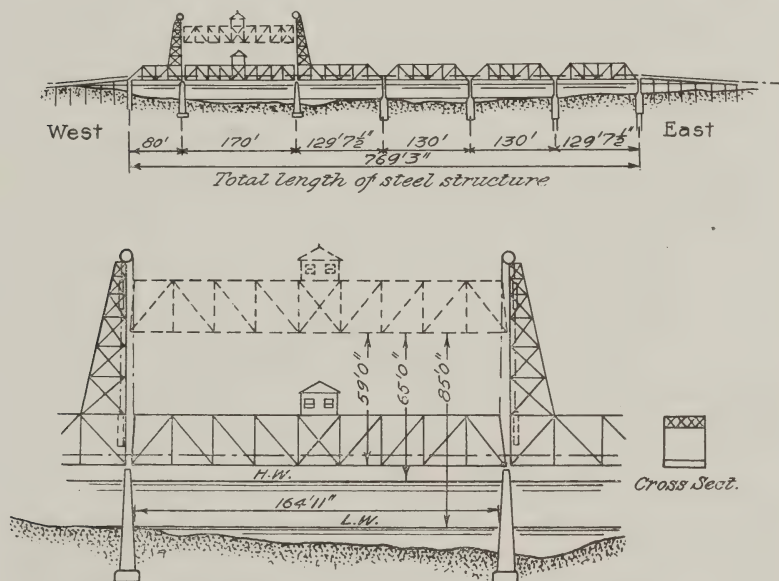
Vertical Lift Bridge over the Sacramento River at Tehama, Cal. Ordinary highway traffic is on a paved roadway 20 feet in the clear. The channel span is raised to accommodate river traffic and is fully balanced by concrete counterweights. It is operated by alternating electric current. The span is raised to its full height or lowered in 90 seconds. Masonry piers support the main spans and the end spans are supported by steel cylinders filled with concrete. The approaches are timber trestles and earth fill. The structure when completed will cost about \$175,000. Waddell & Harrington, Consulting Engineers.
